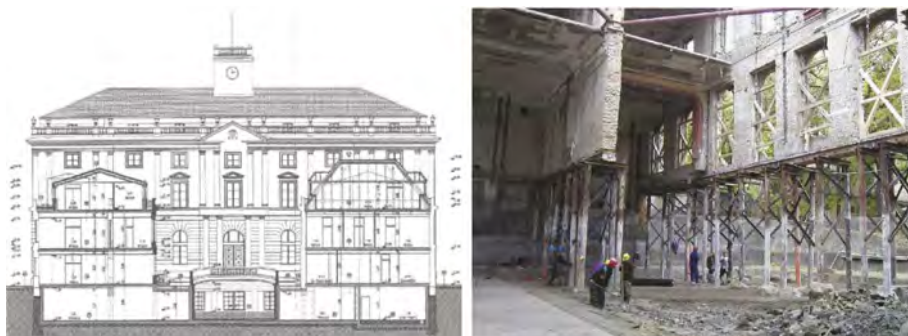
(a) Architectural section of the renewed AEB Bank in Budapest. (b) The building “in the air”.
